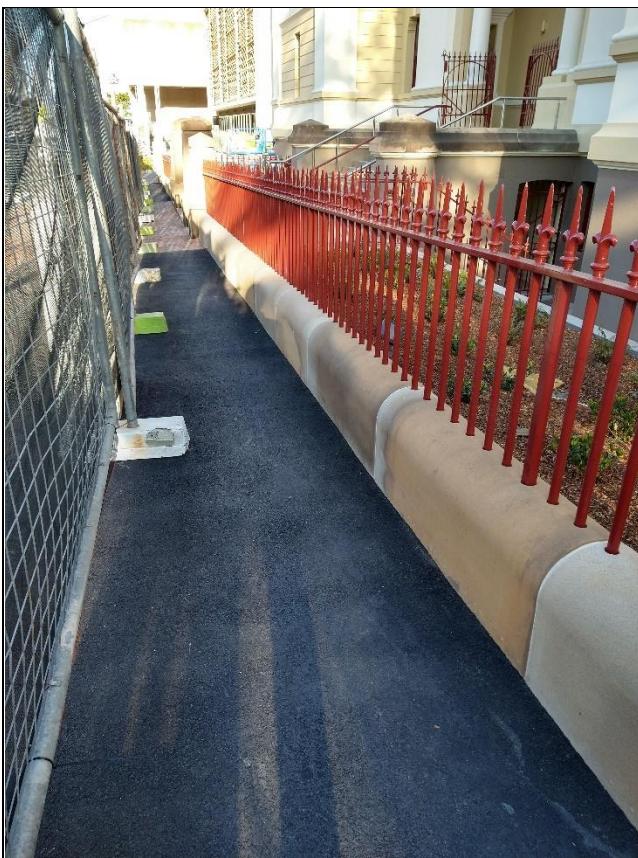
Looking east at asphalt paving and adjacent garden bed along the northern side (front) of the central building (20 August 2021)
